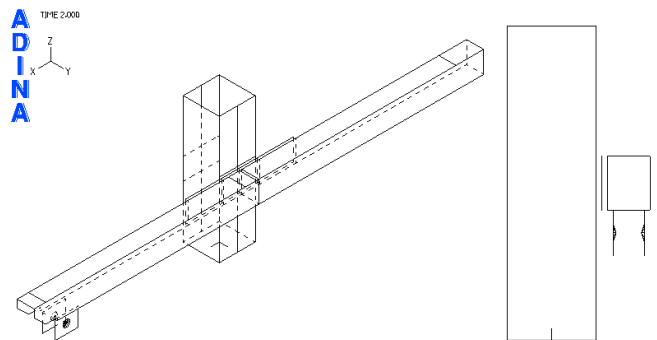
Geometry of the bearing construction with the welded sheet
